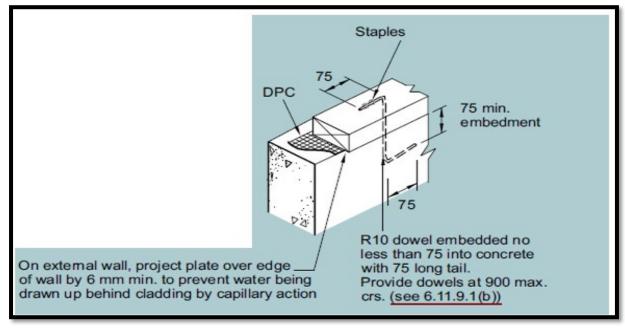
NZS3604:2011fig 6.16 fixing of wall plates to foundation wall with R10 dowels
